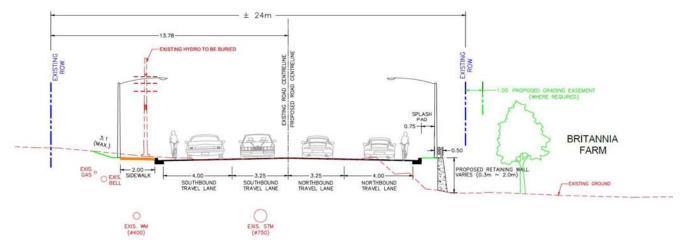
Typical Section - south of Ceremonial Drive Intersection (Sta. 10+590)
